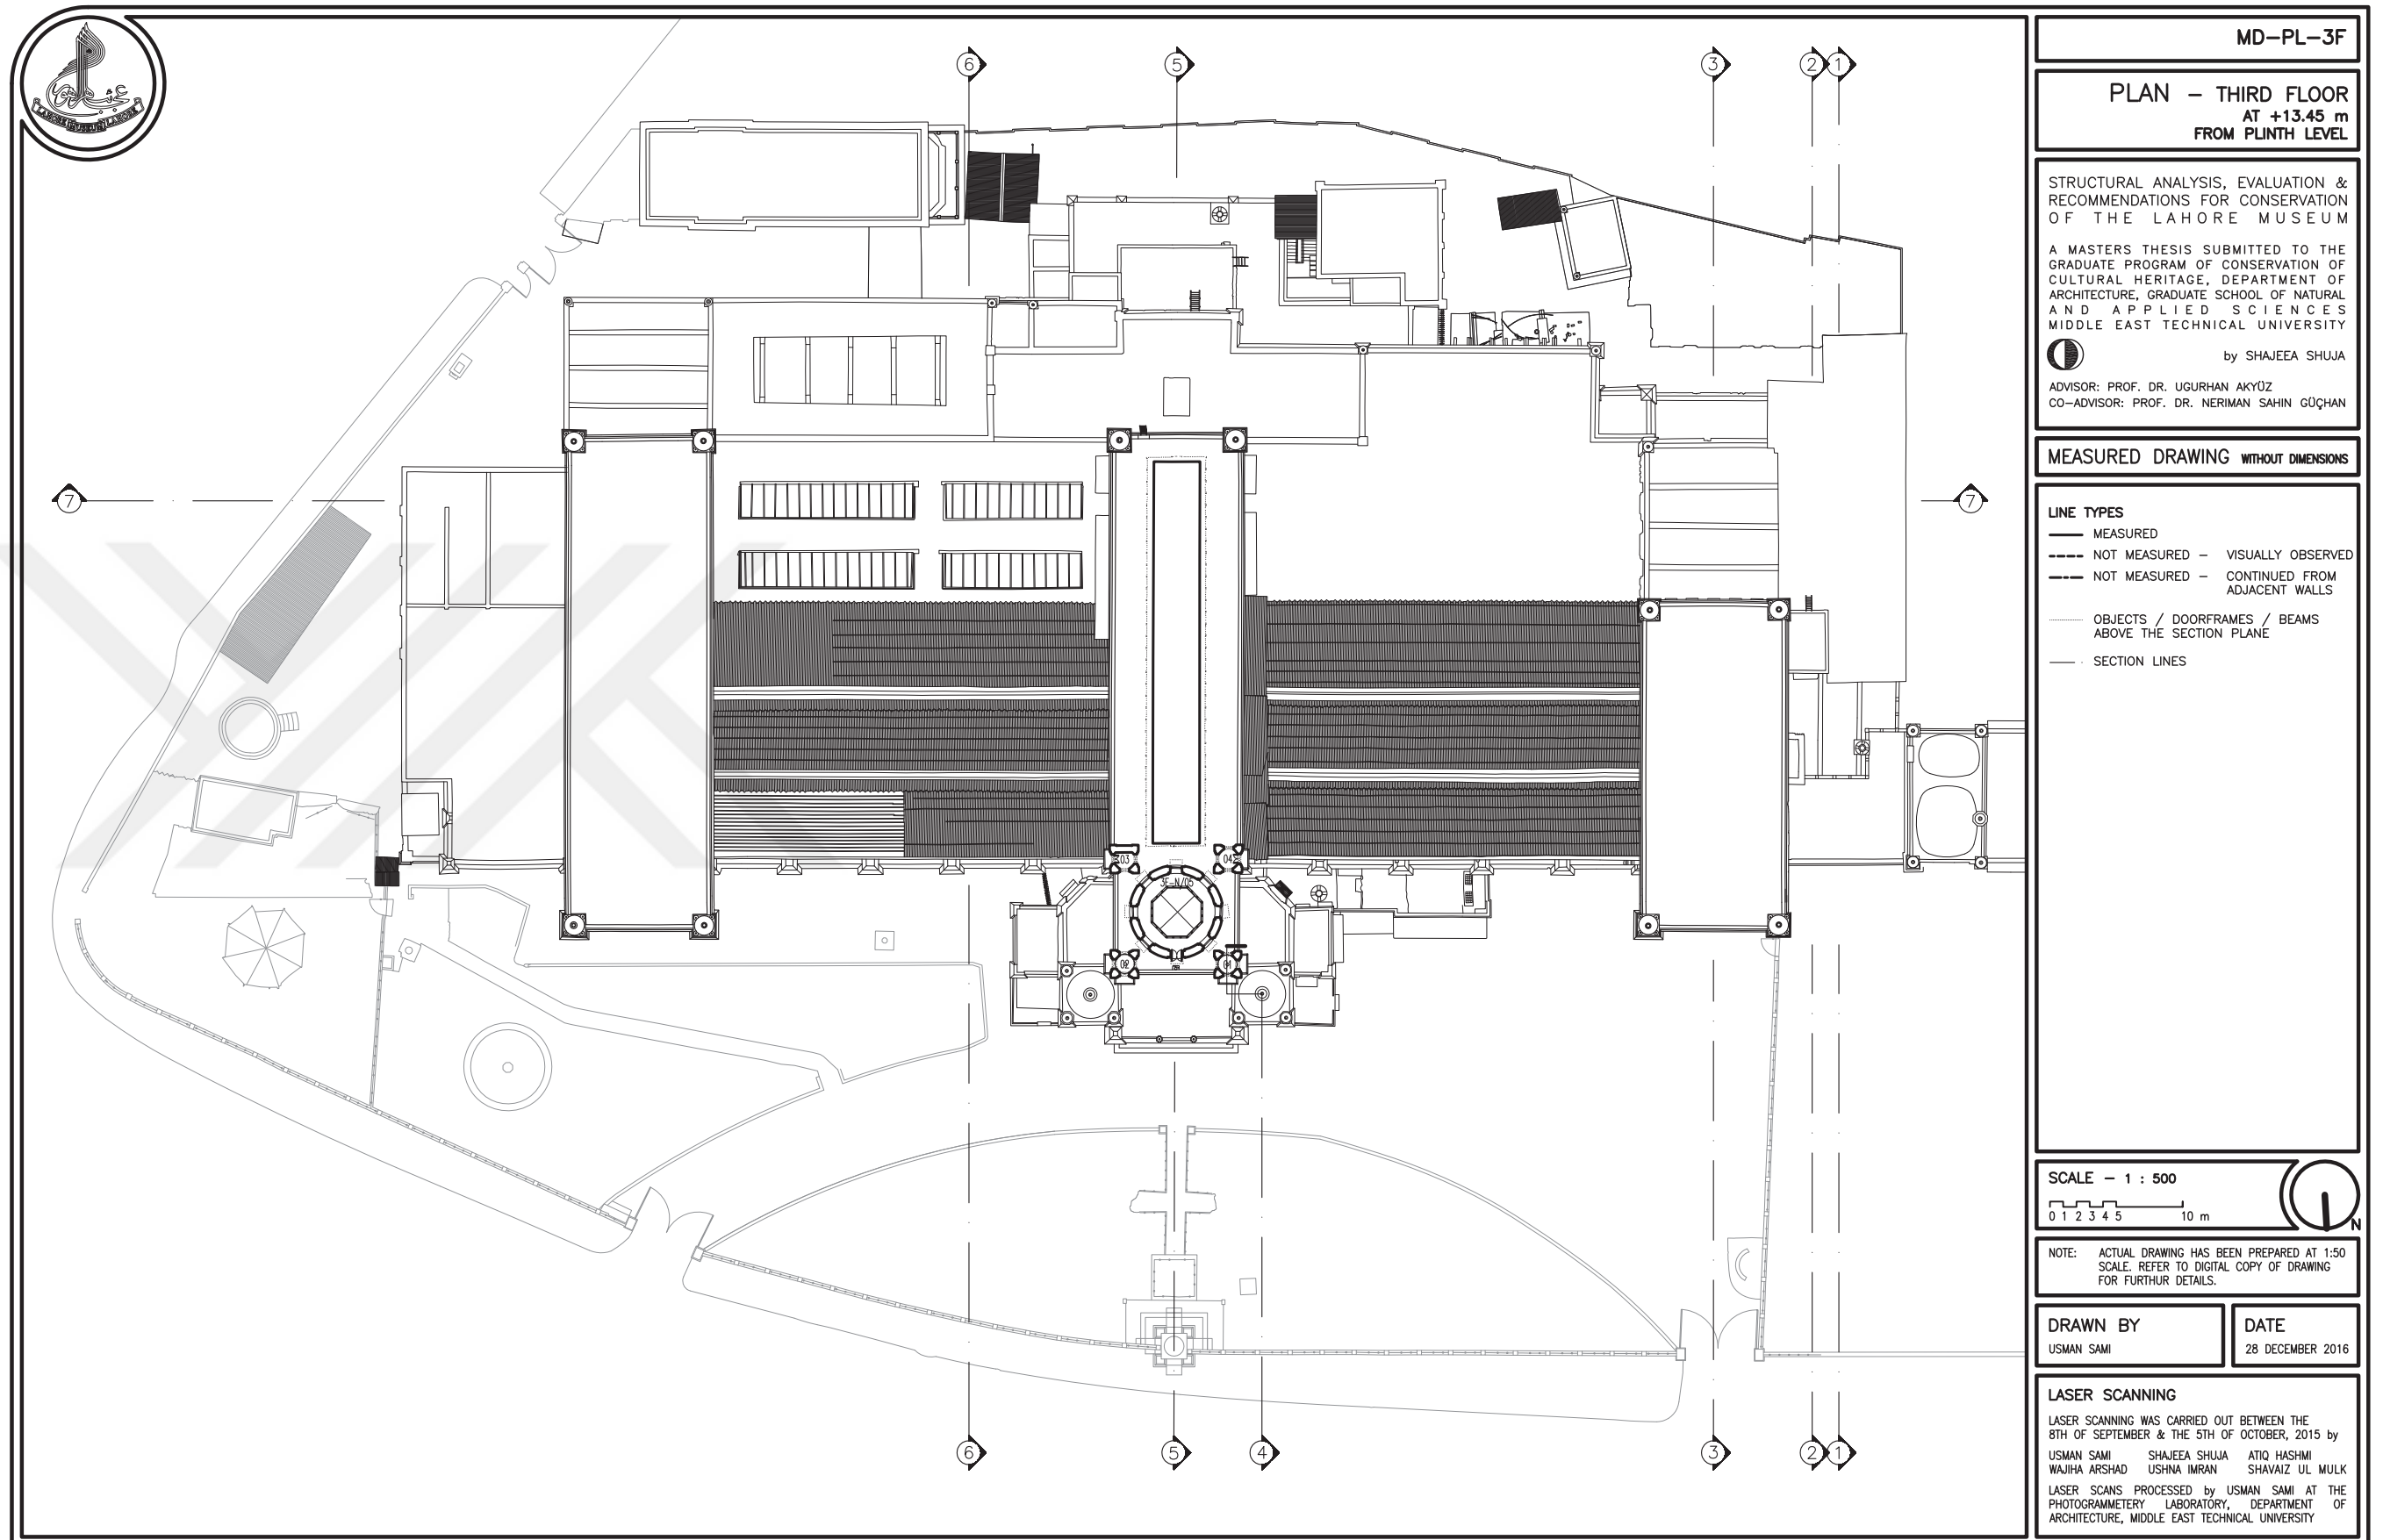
MD-PL-3F – Measured Drawing – Plan – Third Floor (2016)
